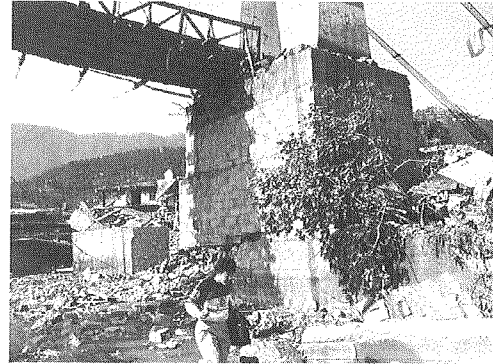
Suspension bridge near Balakot bridge: The right tower was cut off and shifted towards downstream side.
